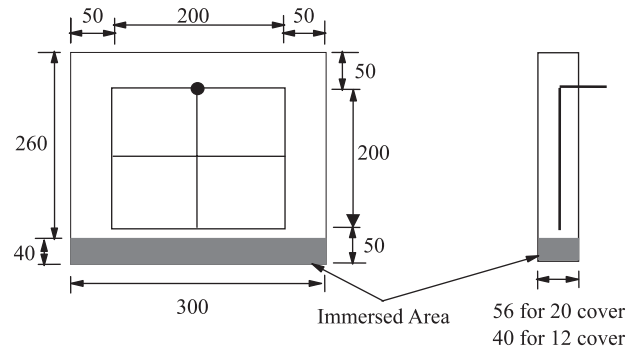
Concrete slab with steel reinforcement mesh (dimension in mm).
